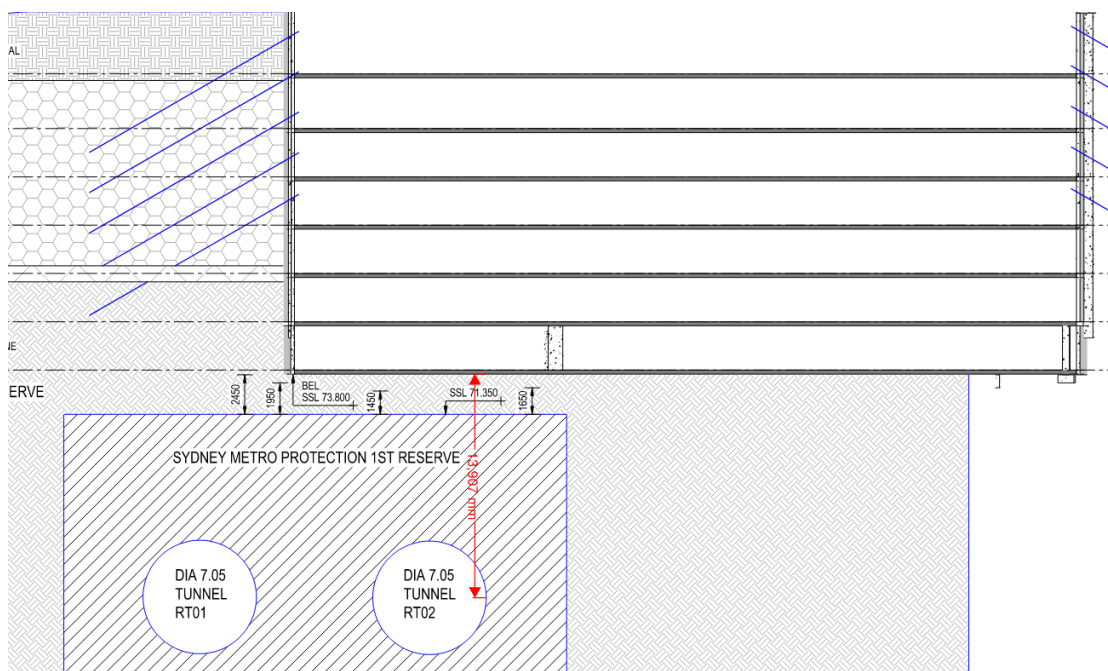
Distance Between Metro Tunnel and the Building Foundations
